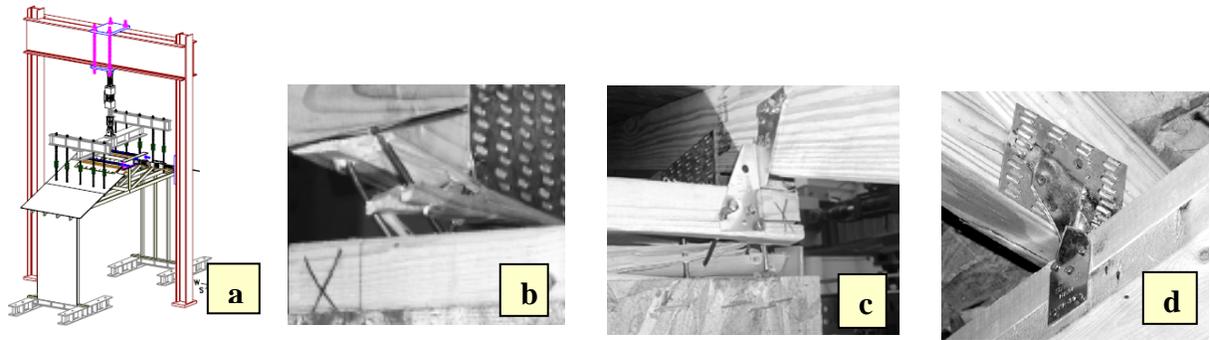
(a) Test Setup at NIST, (b to d) Typical Failure Modes of Roof-to-Wall Connections for NIST, NAHB
